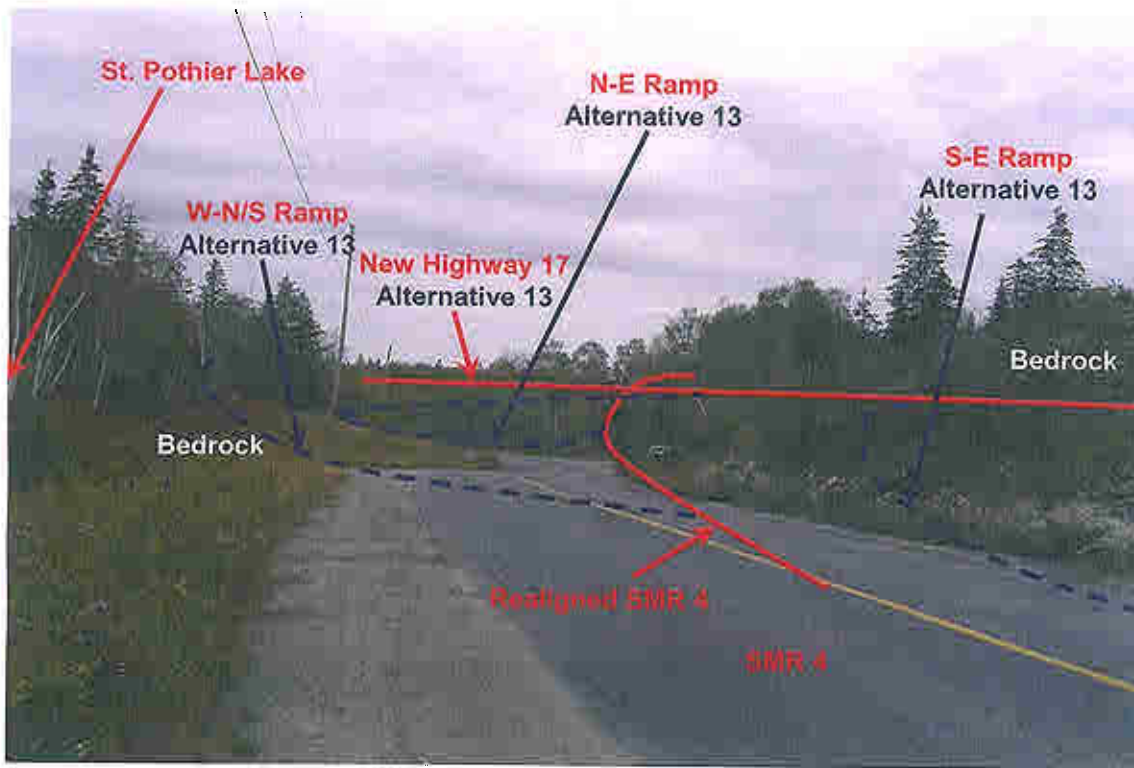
VIEW: Looking south from bedrock outcrop on south side of Huron Central Railway about 250 m east of existing SMR 3/SMR 4 intersection. (September 12, 2006)
